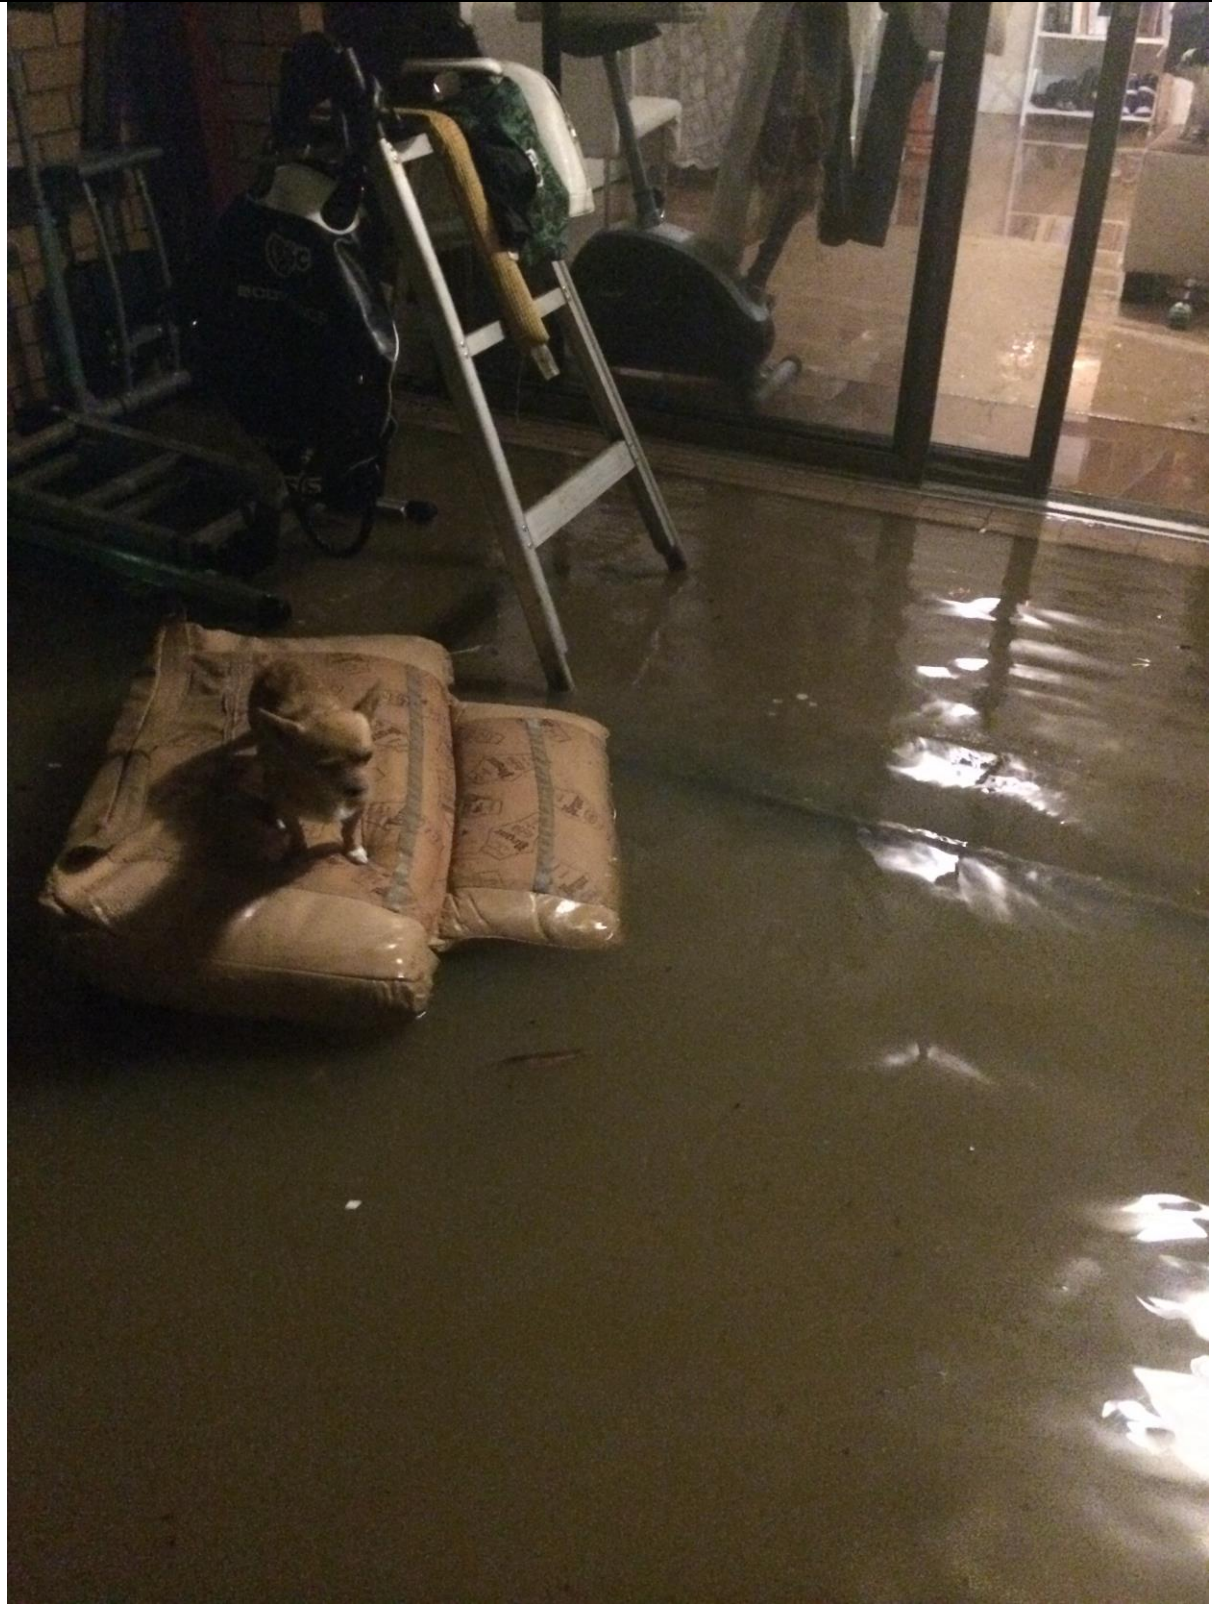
Above-floor flooding in ground floor unit at No. 66-68 Putland Street, St Marys
